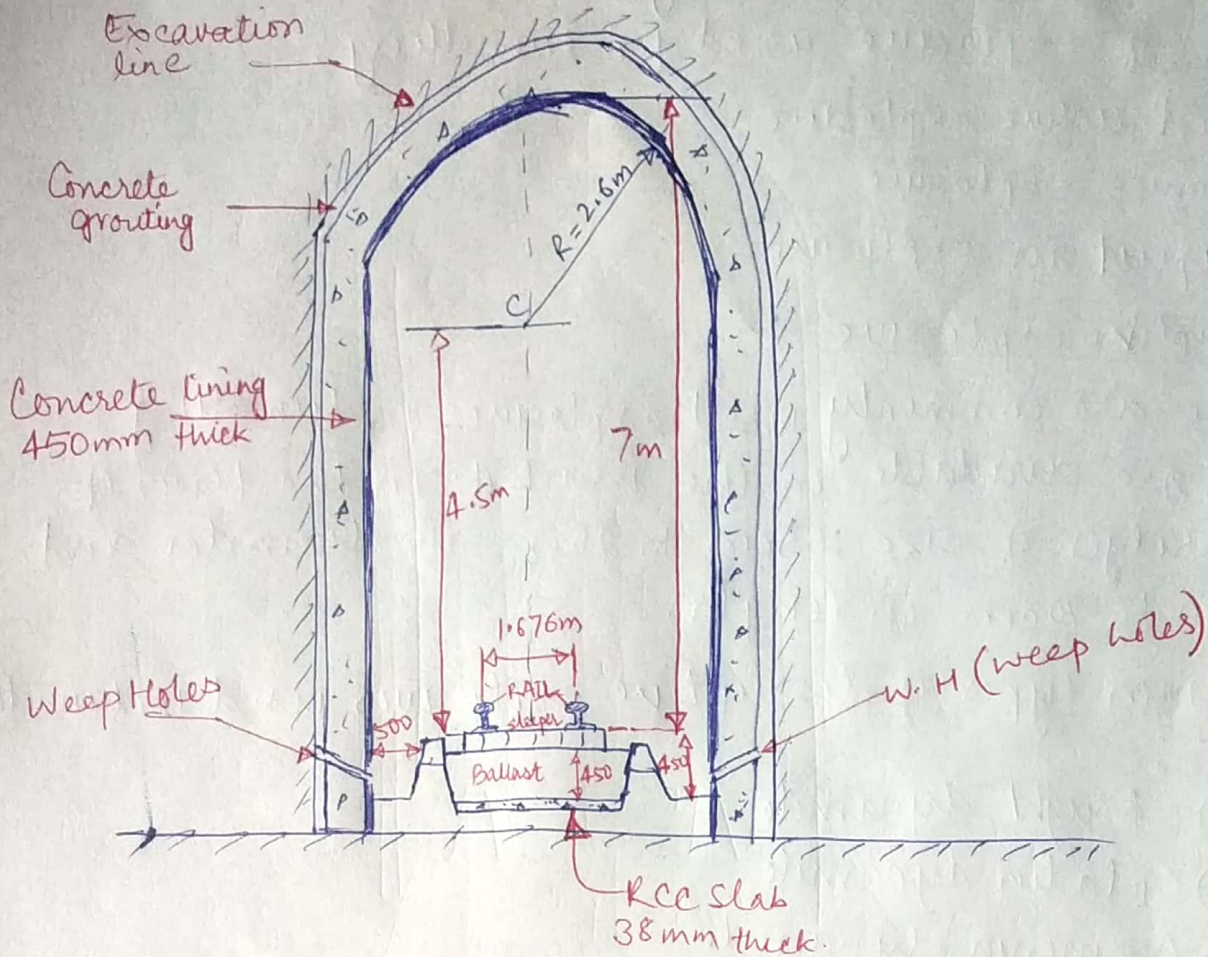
The cross-section of a tunnel, showing the dimension for a single lane. ~~1300~~
